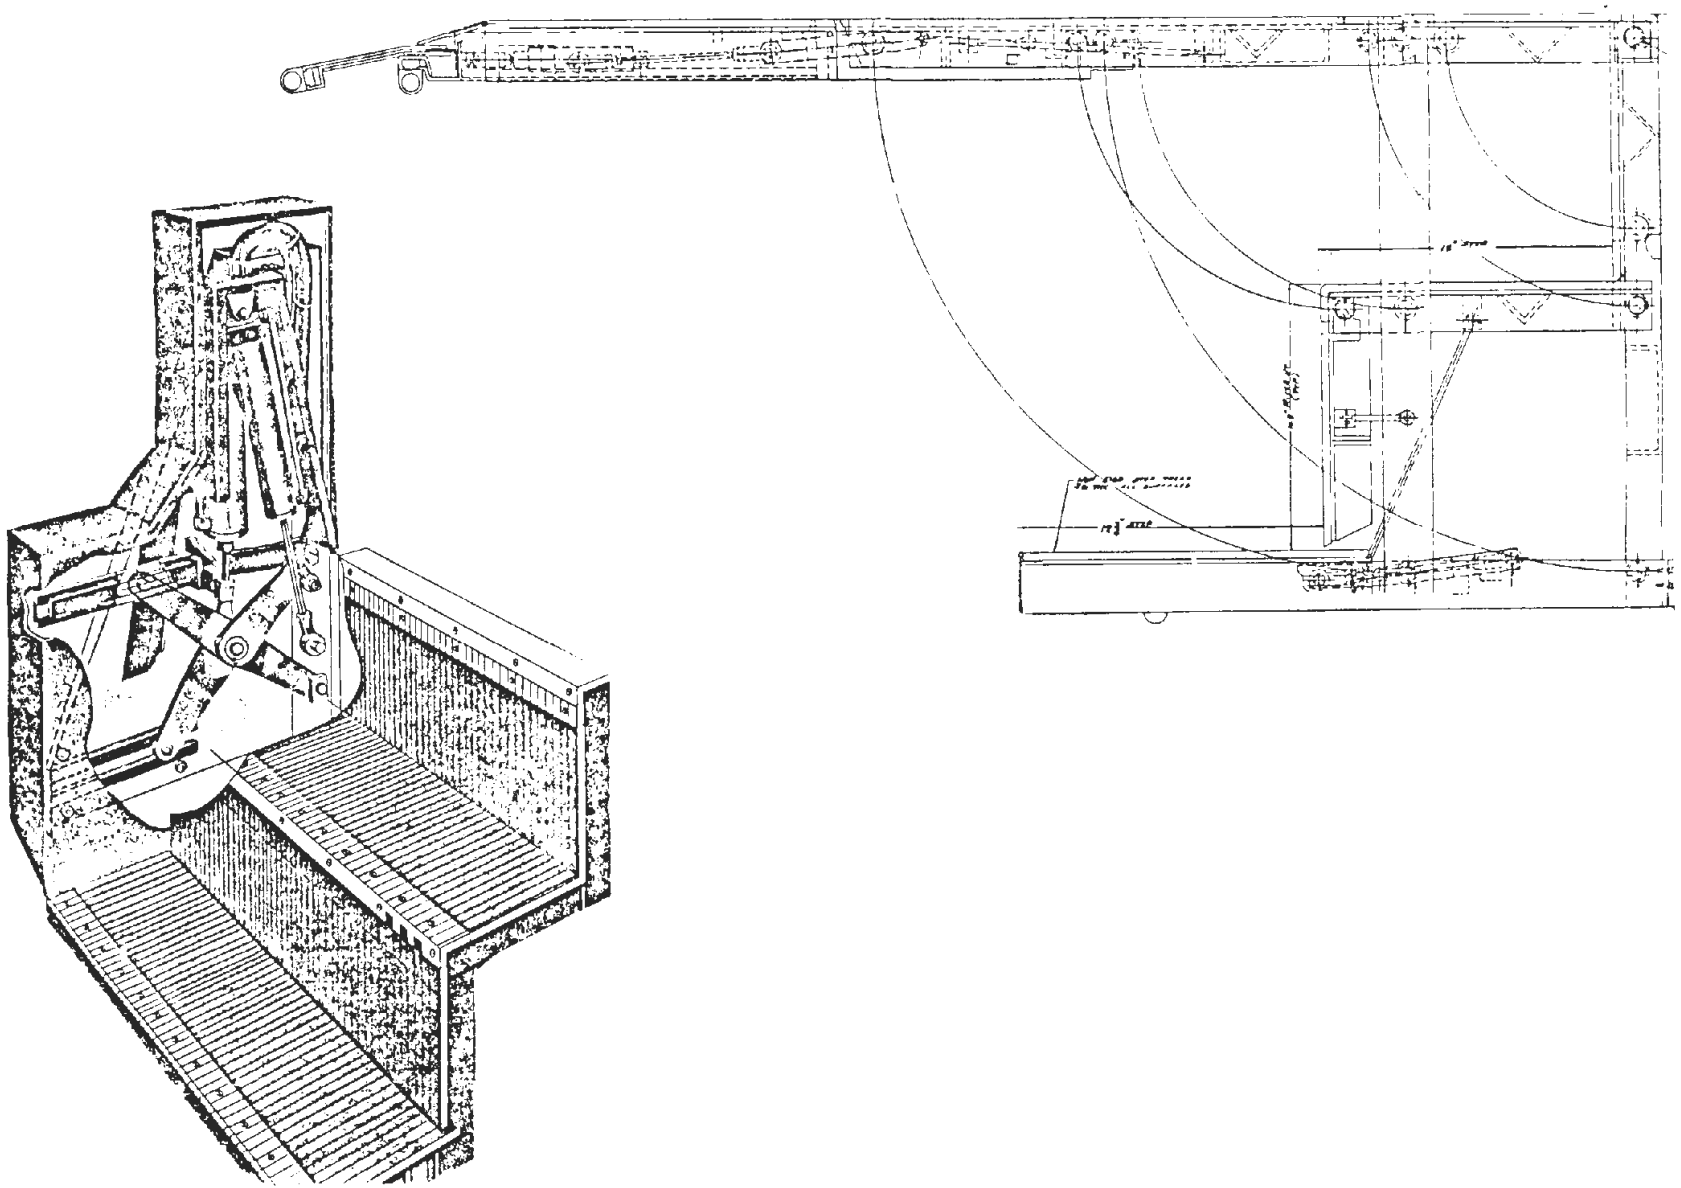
TRAVELIFT TOWER AND PLATFORM INSTALLATIONS
